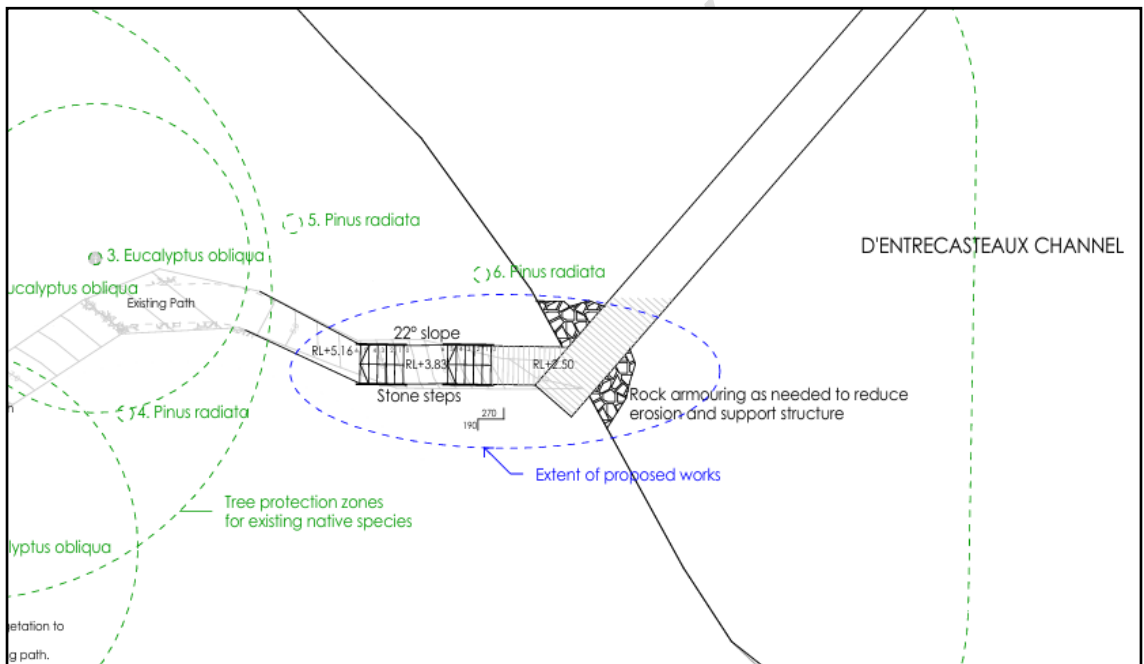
Plan of proposed pathway upgrade works (Burbury).
